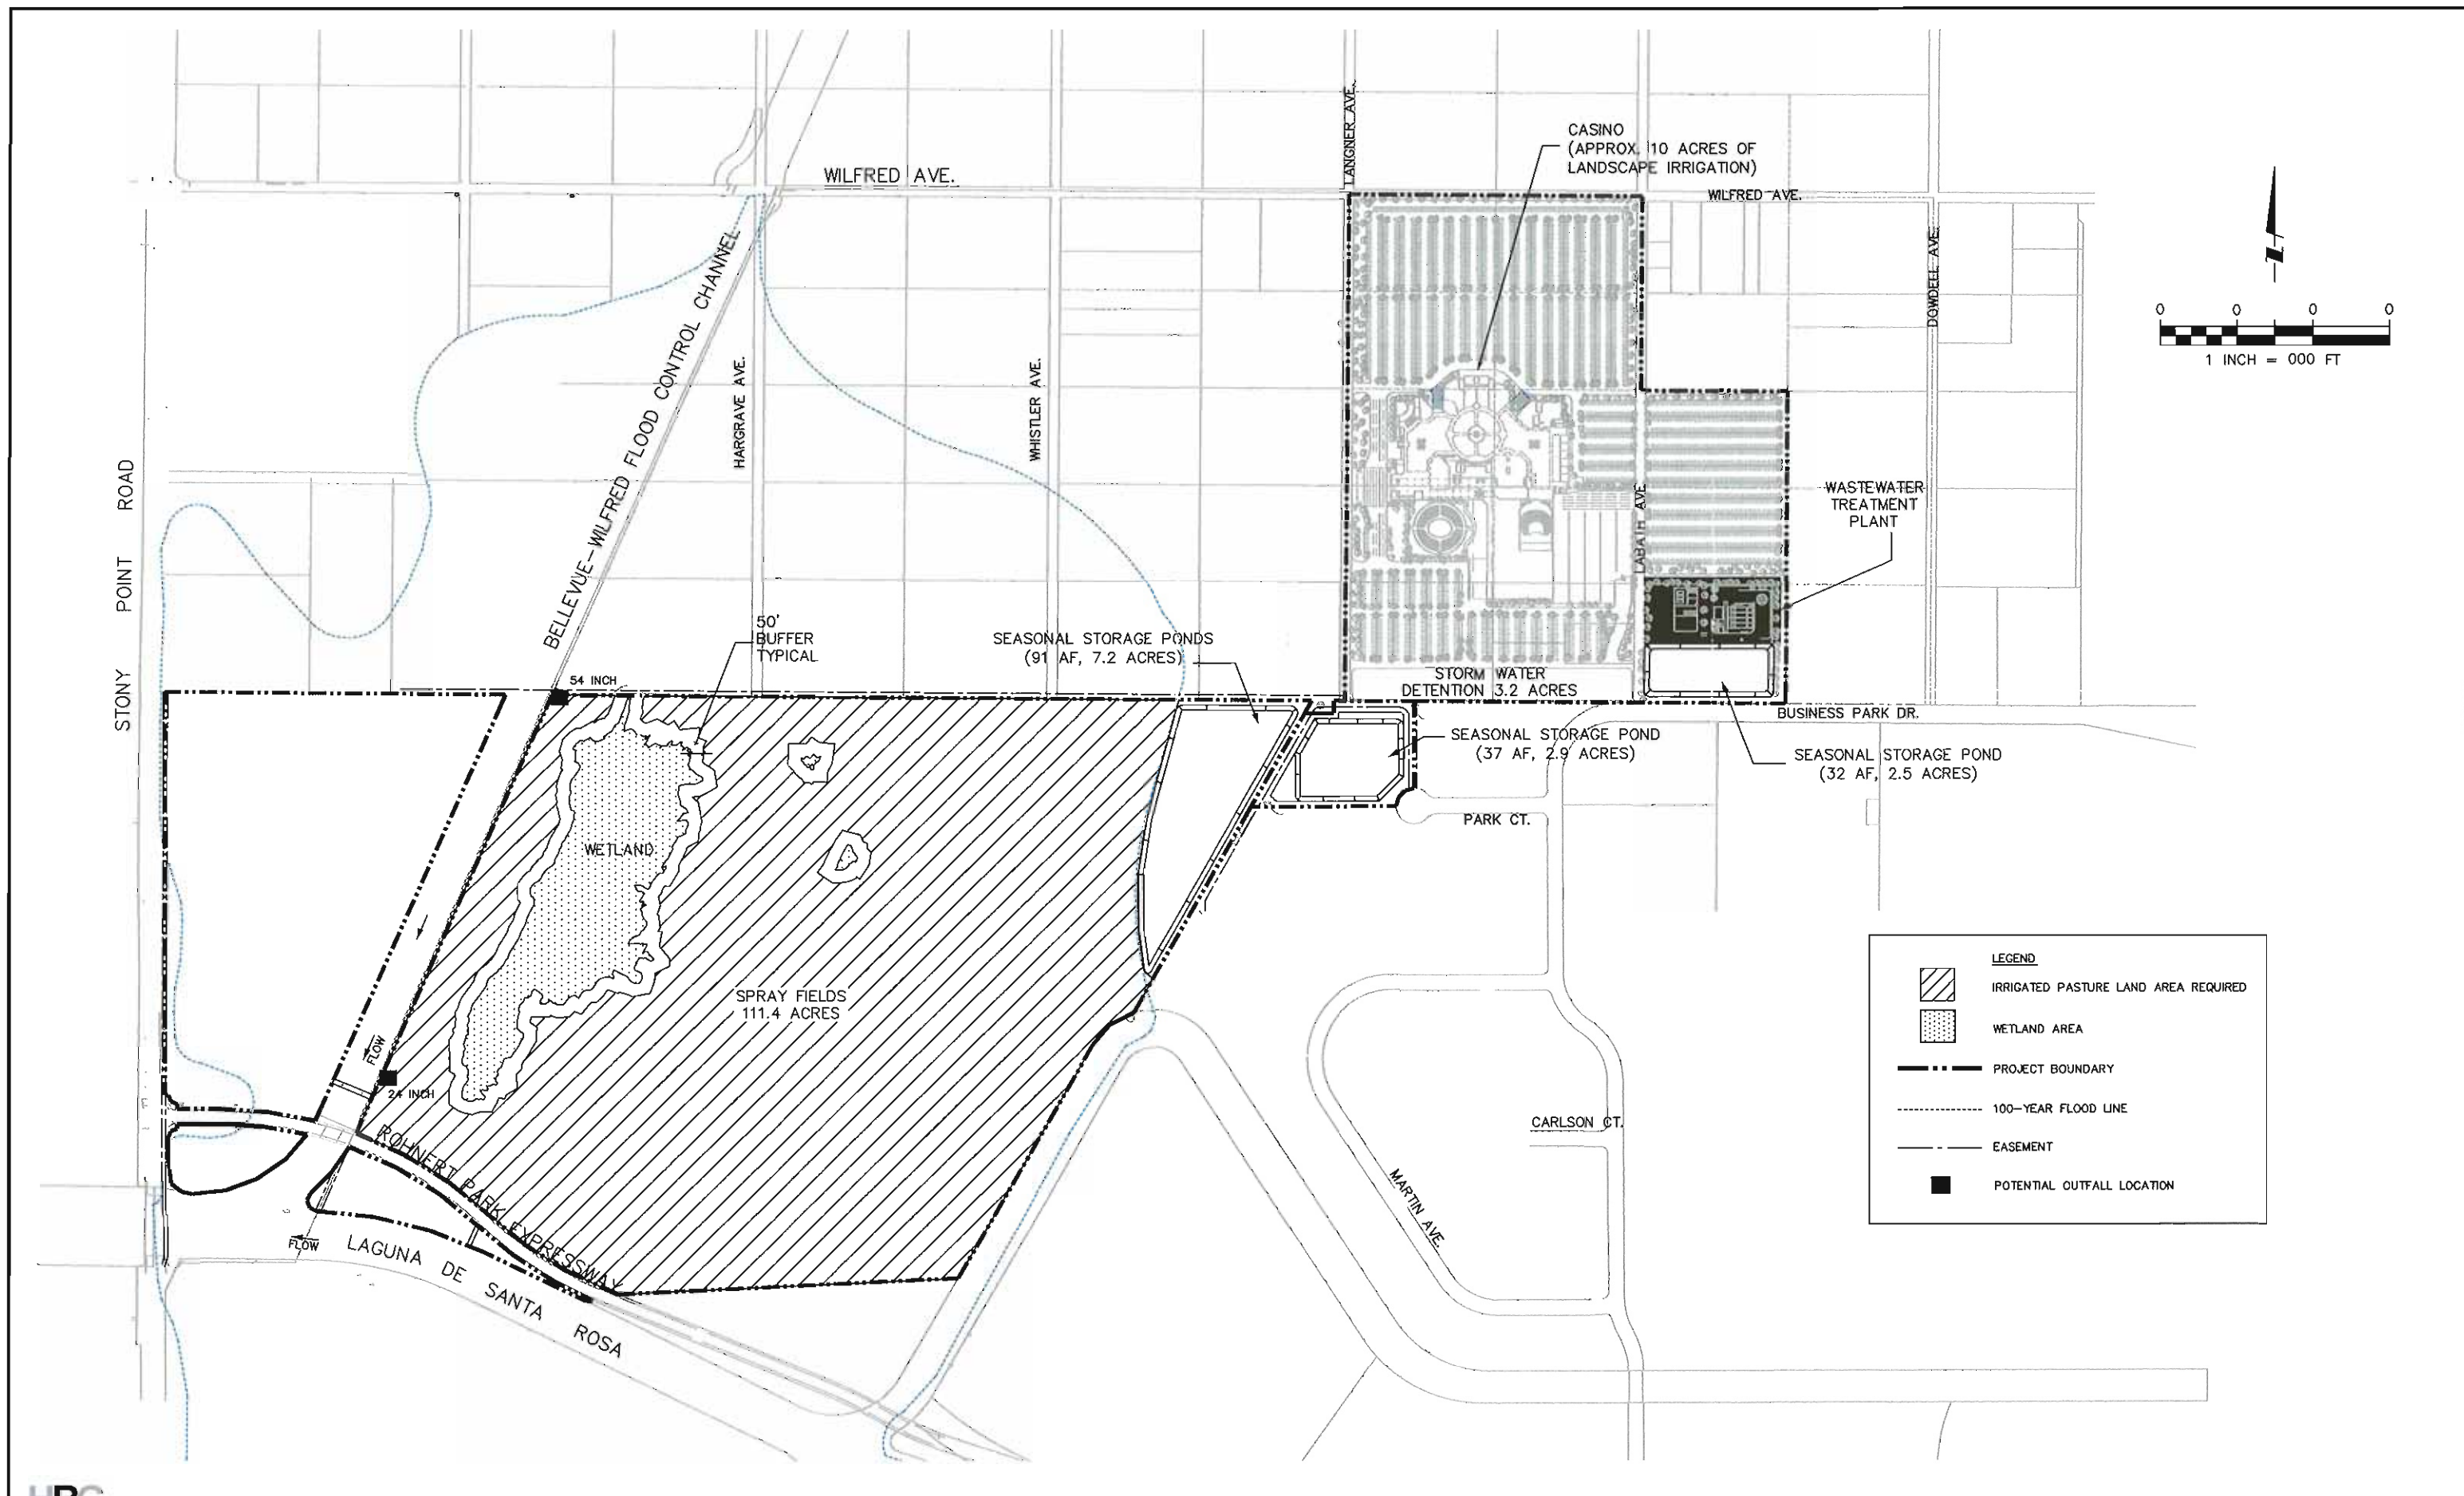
Project Development Plan for Alternative A - Wet Season Storage (Alternative A2)
